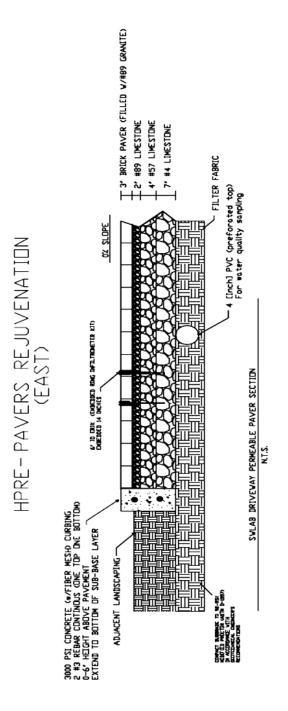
Cross-sectional view of Hanson Pavers Rejuvenation (HPR)
